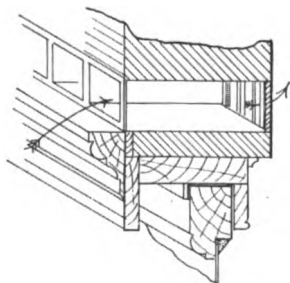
Air Exits in Walls of a Dining- or Drawing-room.
